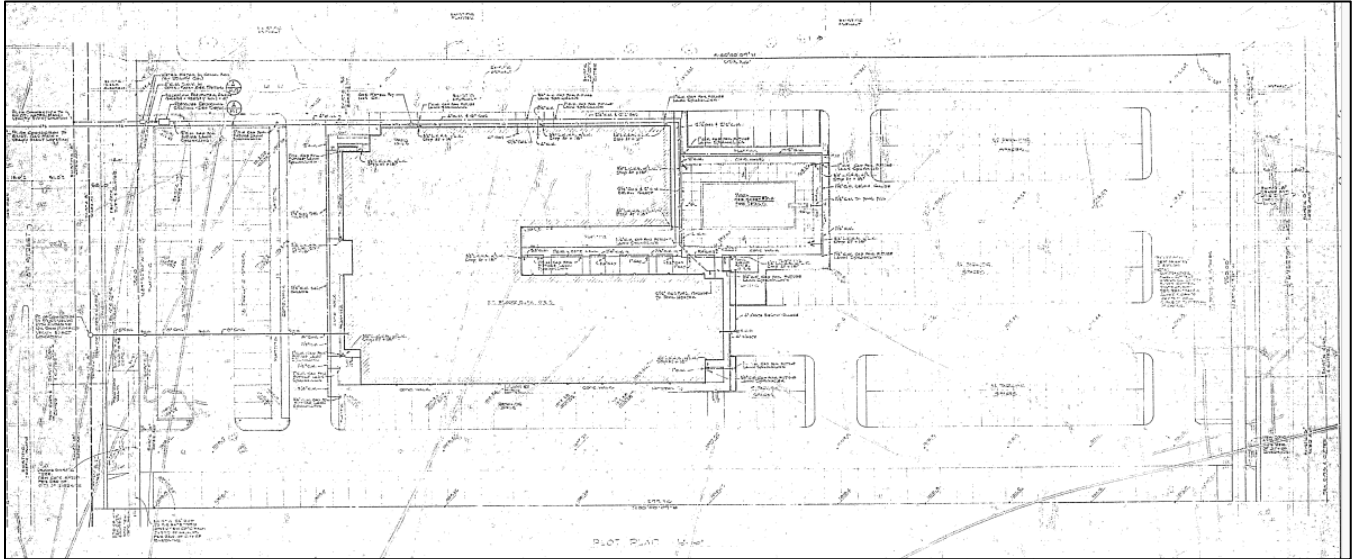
Site Plan of 1200 University Avenue, 1968 (Rissman & Rissman Associates)
